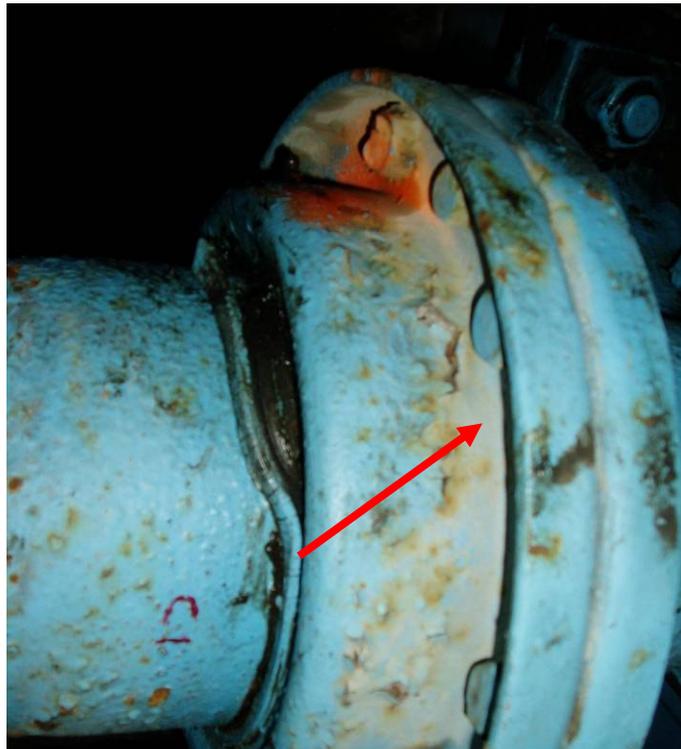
West leaf, south bearing B2, southeast mounting bolt severe corrosion.
